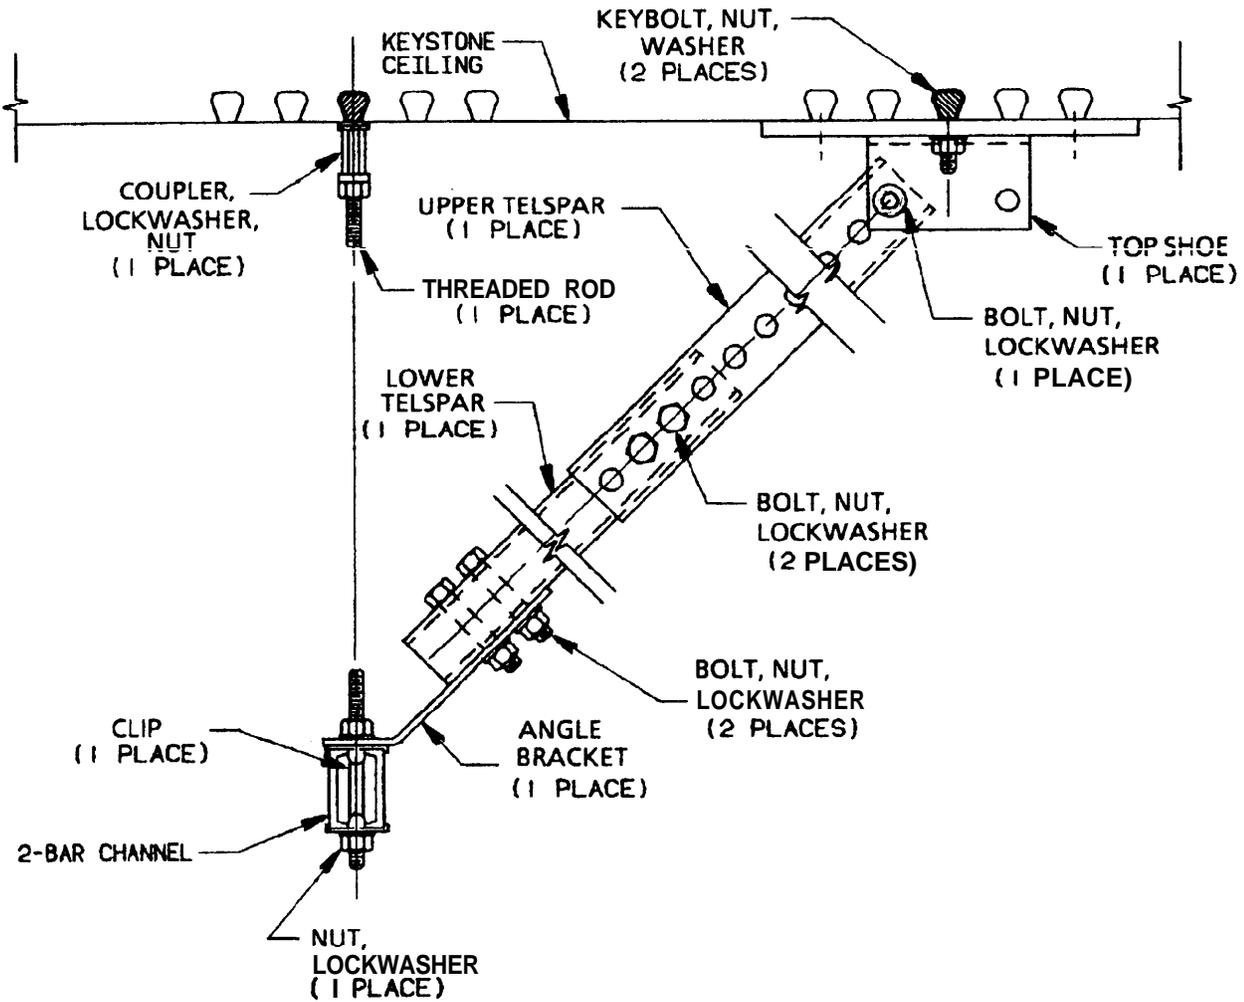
Typical Perimeter Corner Single Bracing TELSPAR With Thread Rod.
